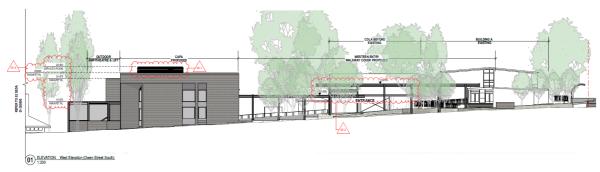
Proposed Owen Street, CAPA/ Entry Streetscape
